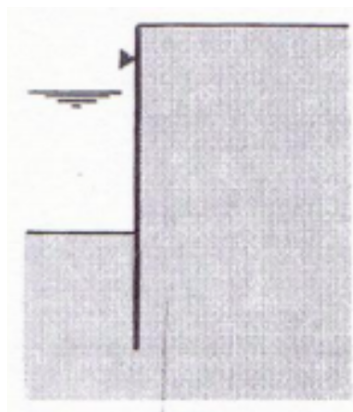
A simple drawing of the bulk head with single anchor structure type [12]
